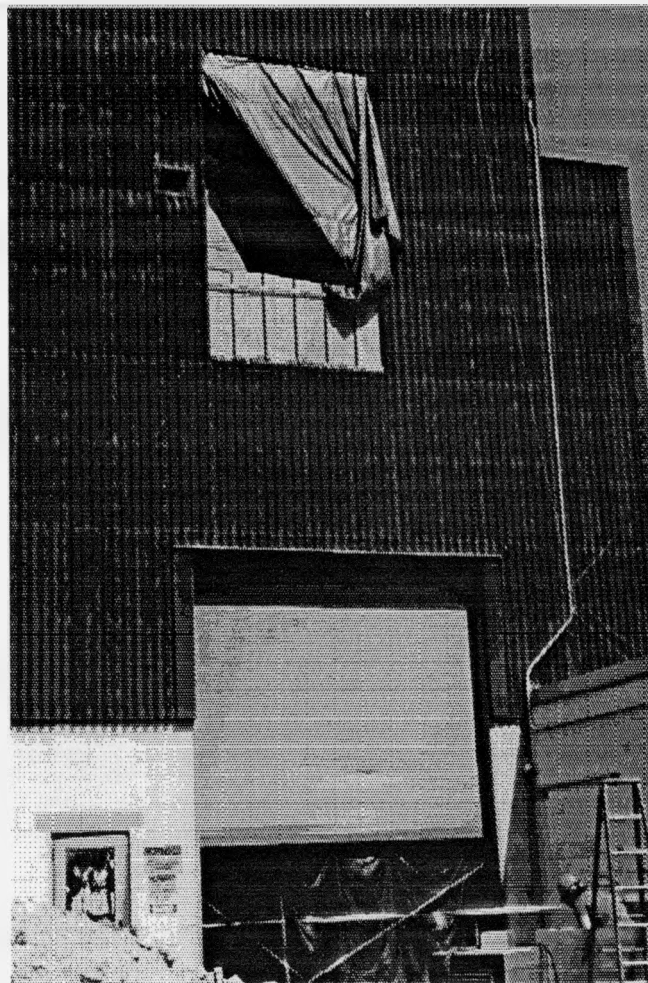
Waste egress path created in the side wall of the MER 1B (top center of photo) (162/07).
